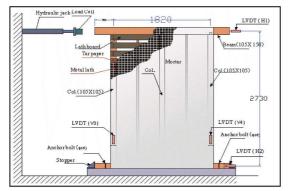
Test Setup and Cut Away Details of Typical Wall Specimen Type 1 (Control)
